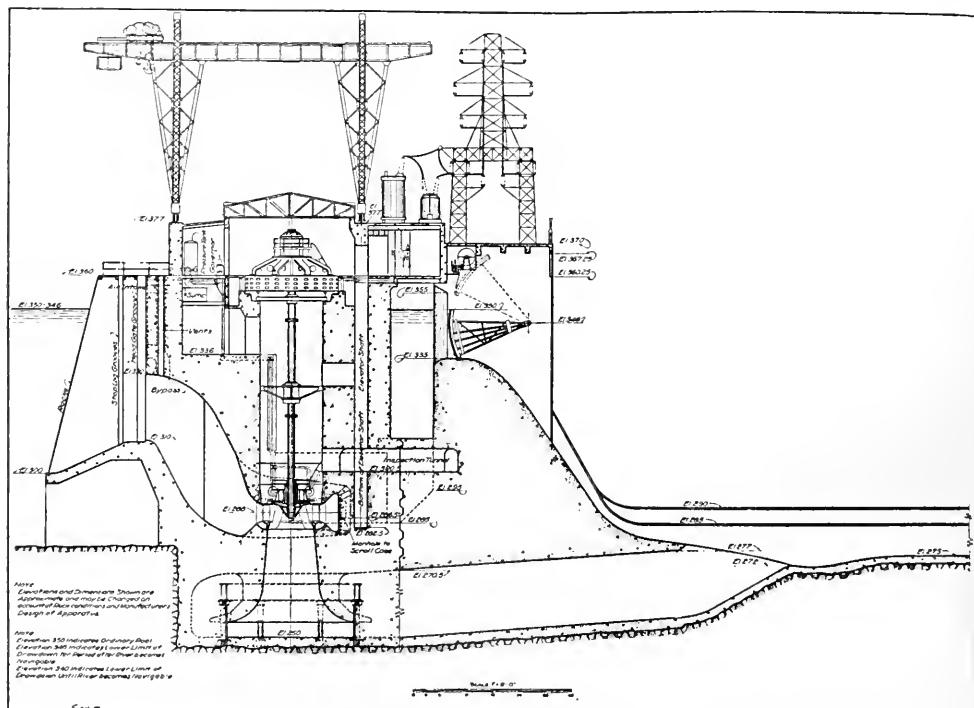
CROSS-SECTIONAL ELEVATION VIEW OF THE POWER HOUSE SHOWN IN FIG. 7
